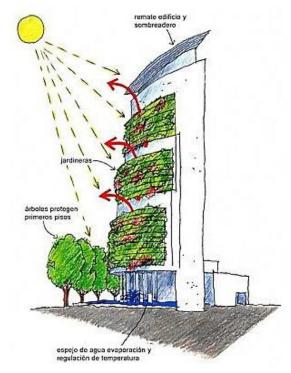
Sketch of the final concept with green elements, using street level trees to shade the first three floors and vertical planting stands for upper floors.
